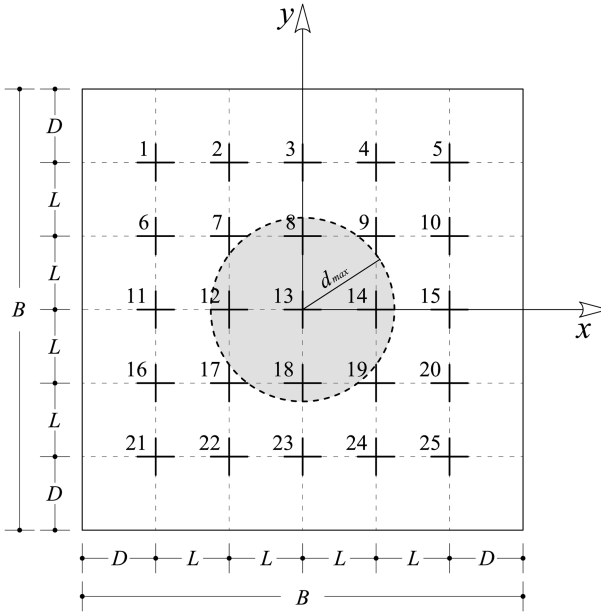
Possible active tuned mass dampers' locations over the top floor.
